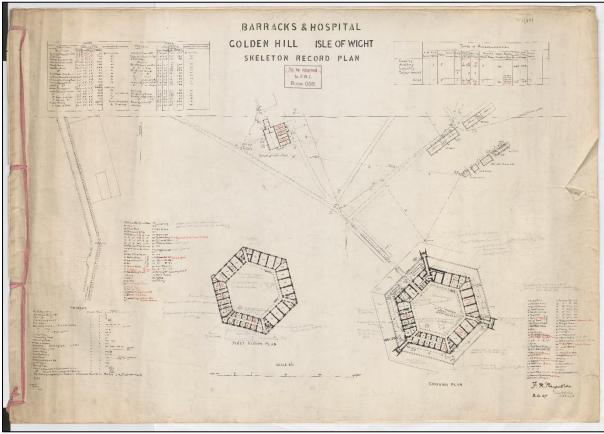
Skeleton Record Plan of Golden Hill Fort and buildings 3rd April 1907 (National Archives WO 78/3740)
